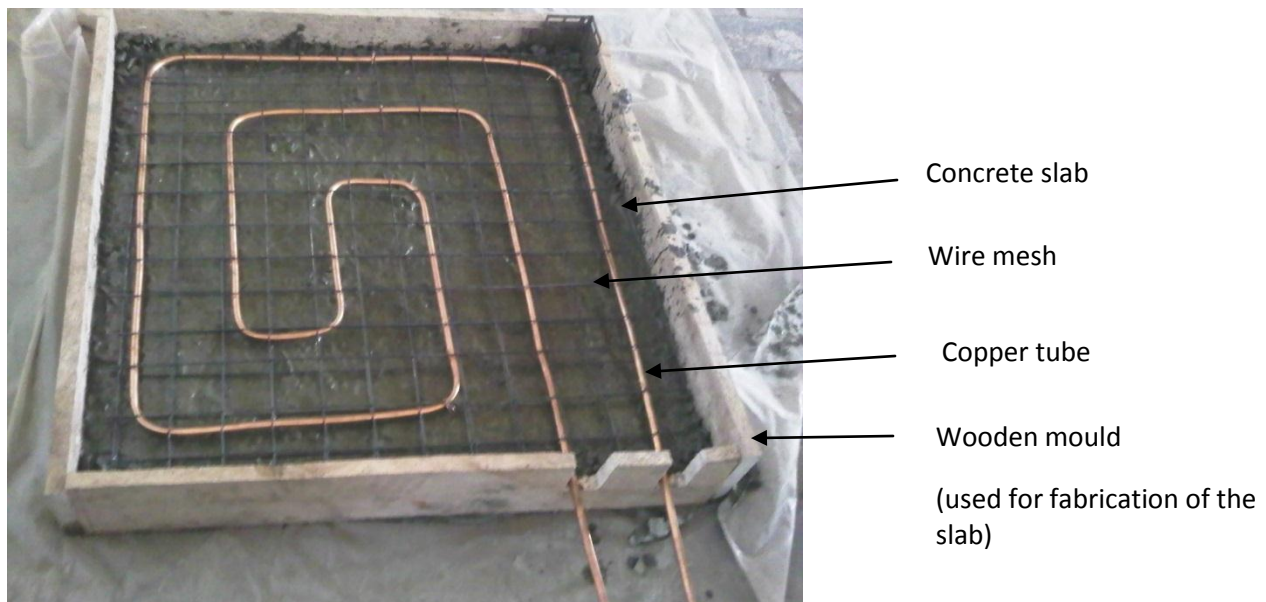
Copper tubing placed on concrete during fabrication of floor
